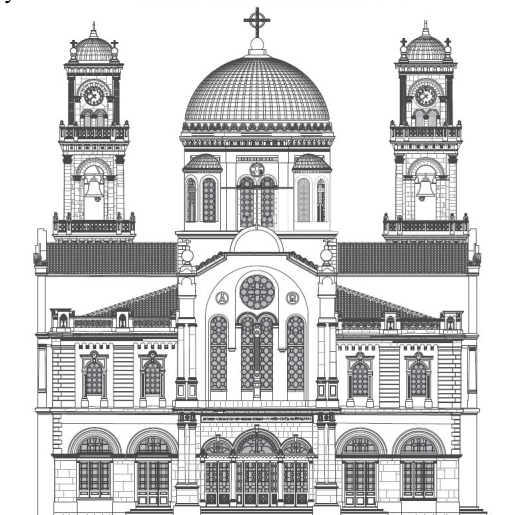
The architectural drawing of the West Façade (main façade) of the Metropolitan Church of Saint Minas.
